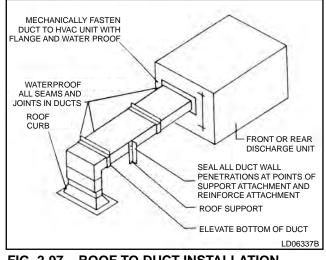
ROOF TO DUCT INSTALLATION -HORIZONTAL DISCHARGE
